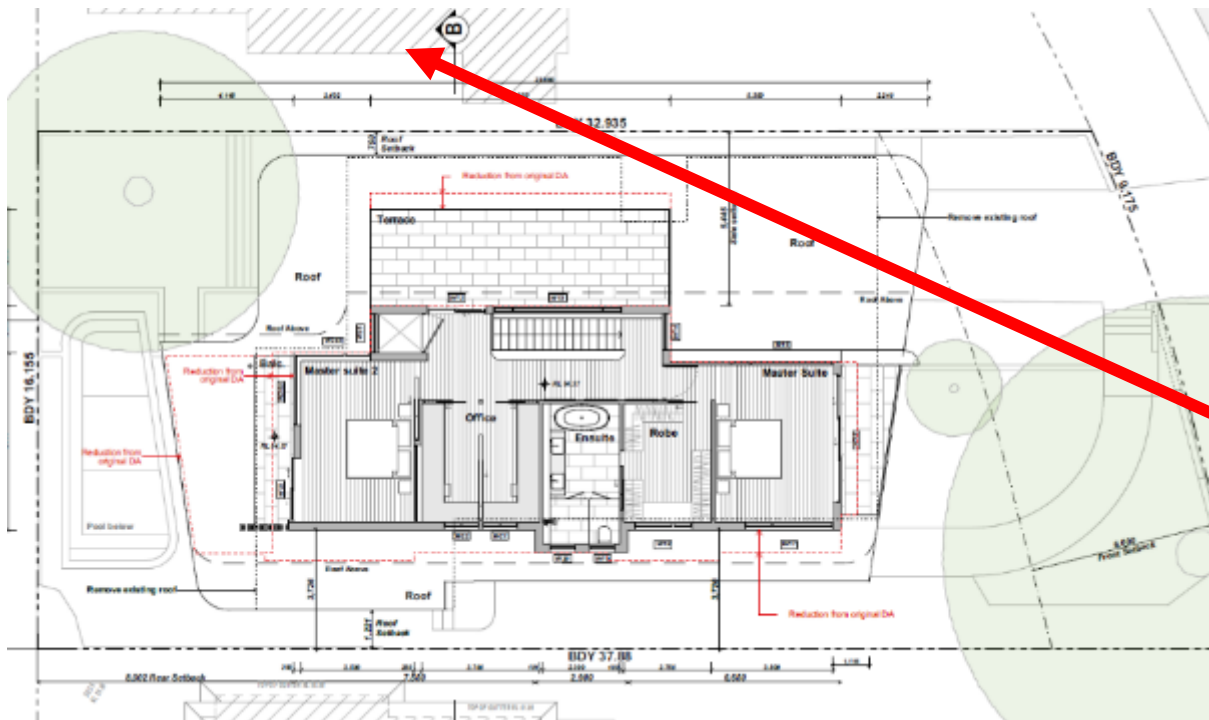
Plan extract showing maintained view corridor across the north-western corner of the subject property.
